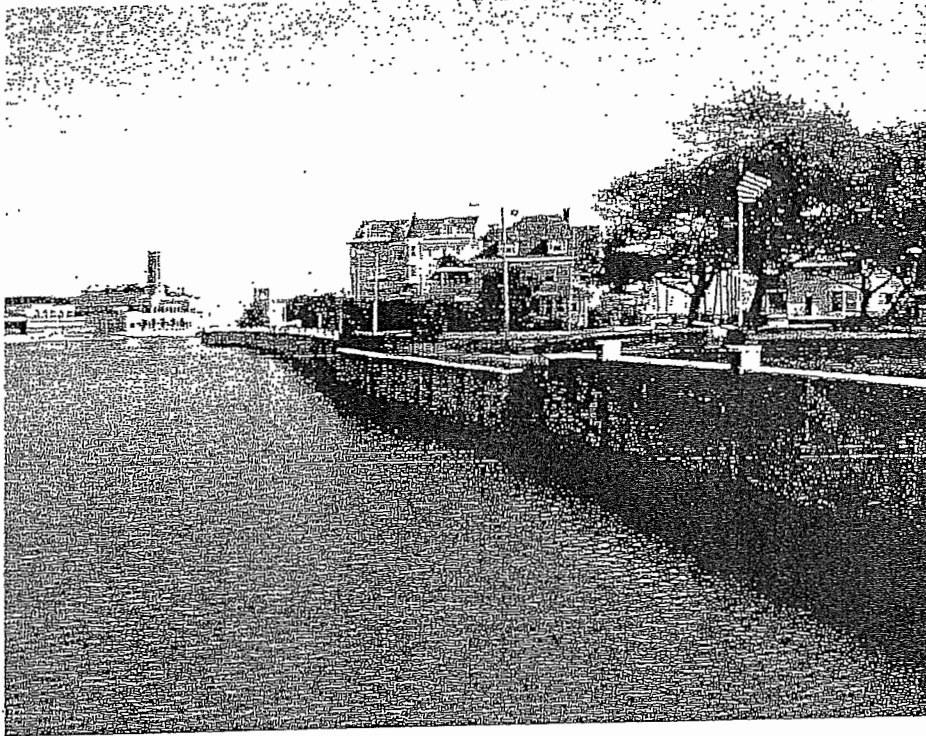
View looking East from East Pedestrian Bridge. Notice Segment of Newer Concrete Bulkhead Bulkhead Wall.
